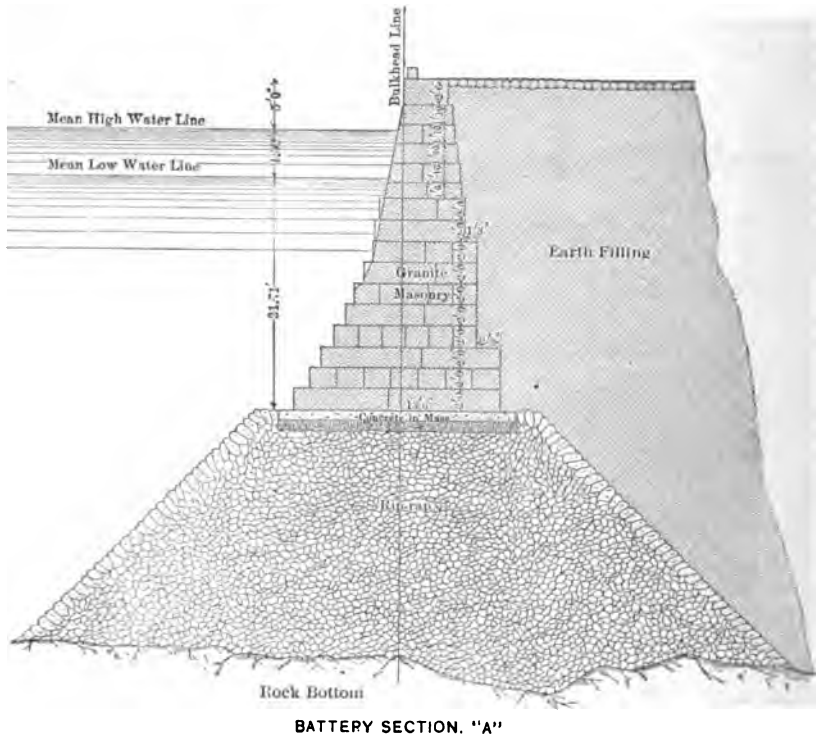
NEW YORK SEA WALL. RIPRAP ON ROCK.
